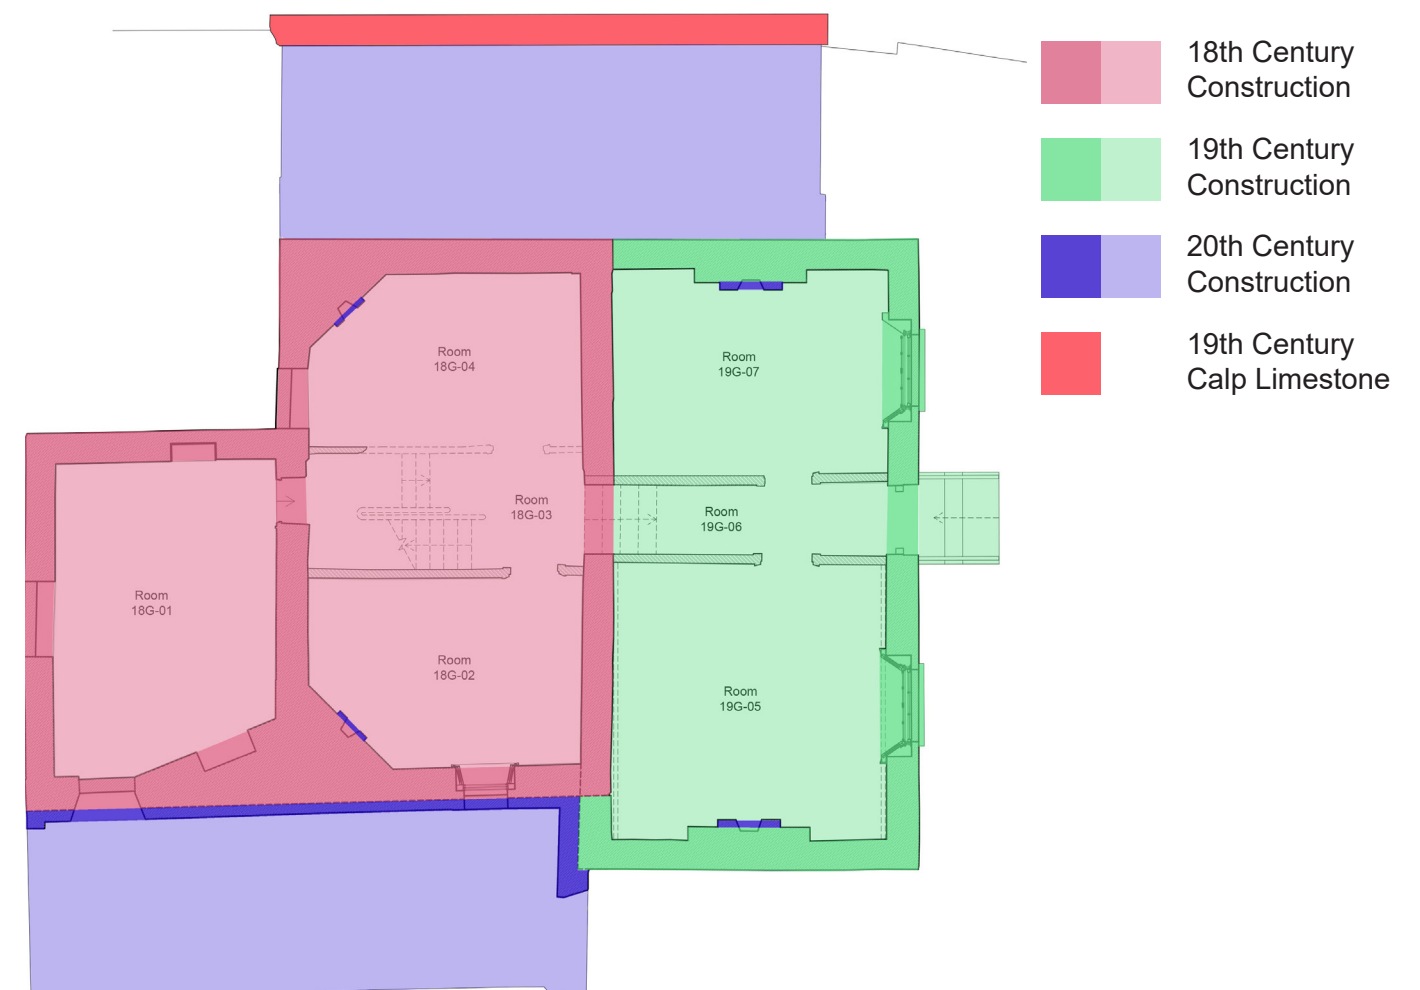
Ground Floor Plan, showing the phases of construction and features
